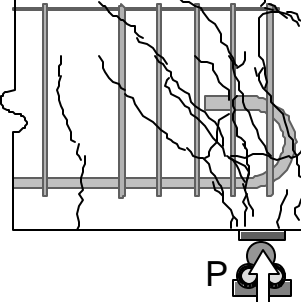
Development of cracks in a heavily confined, hooked bar specimen (CCT-08-45-Hook2-1-C0.012)
